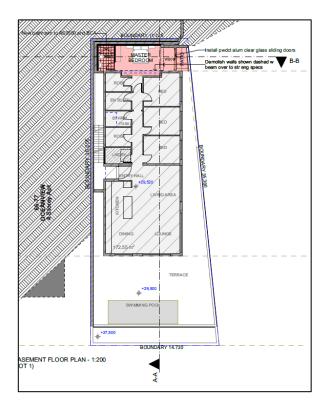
Proposed basement plan (Unit 1). The previous development application involved no changes to Unit 1 at the basement level.
